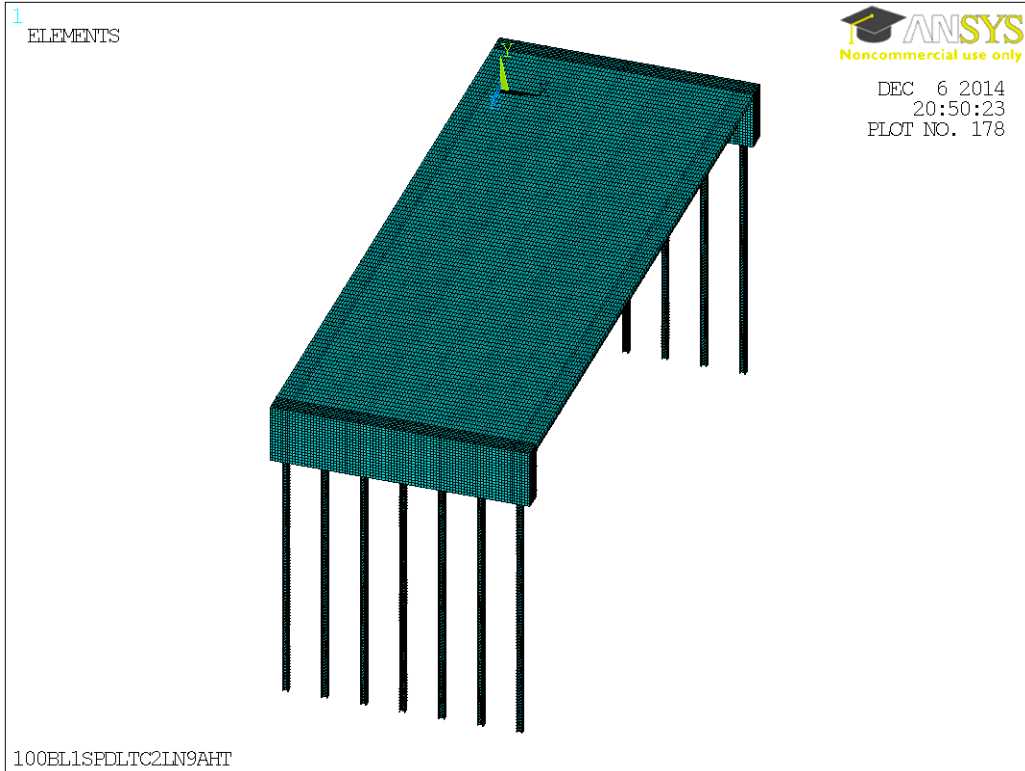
Finite element model of an integral abutment bridge with no cantilever wingwalls
